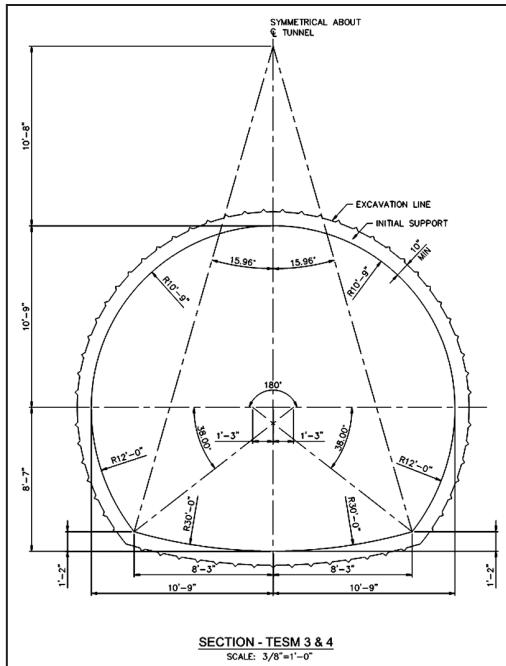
Excavated cross-sectional geometry of TESMs 3 and 4
